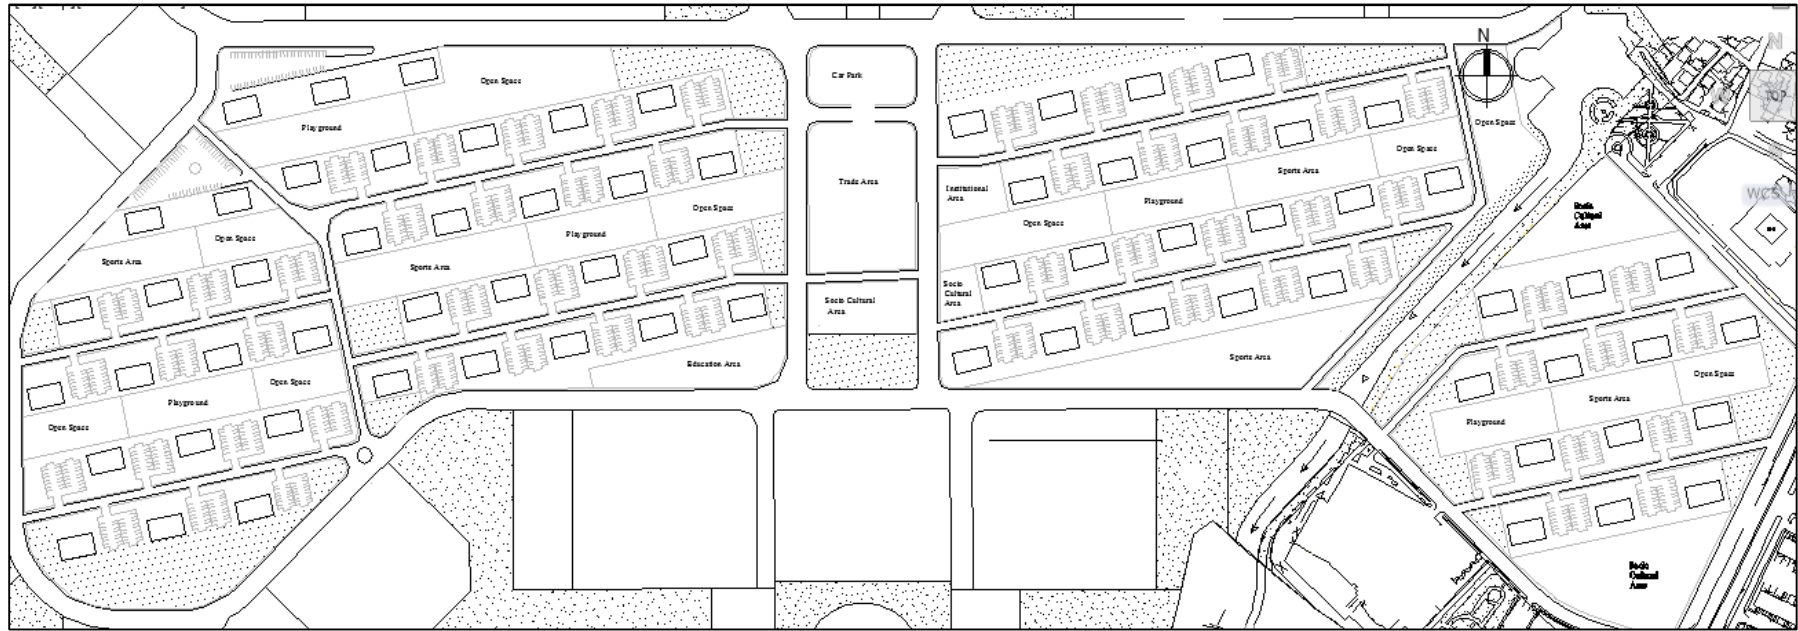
Site plan of eight-storey buildings alternative (Alternative B) (Prepared on Autocad 2013 by Yelda Mert).
